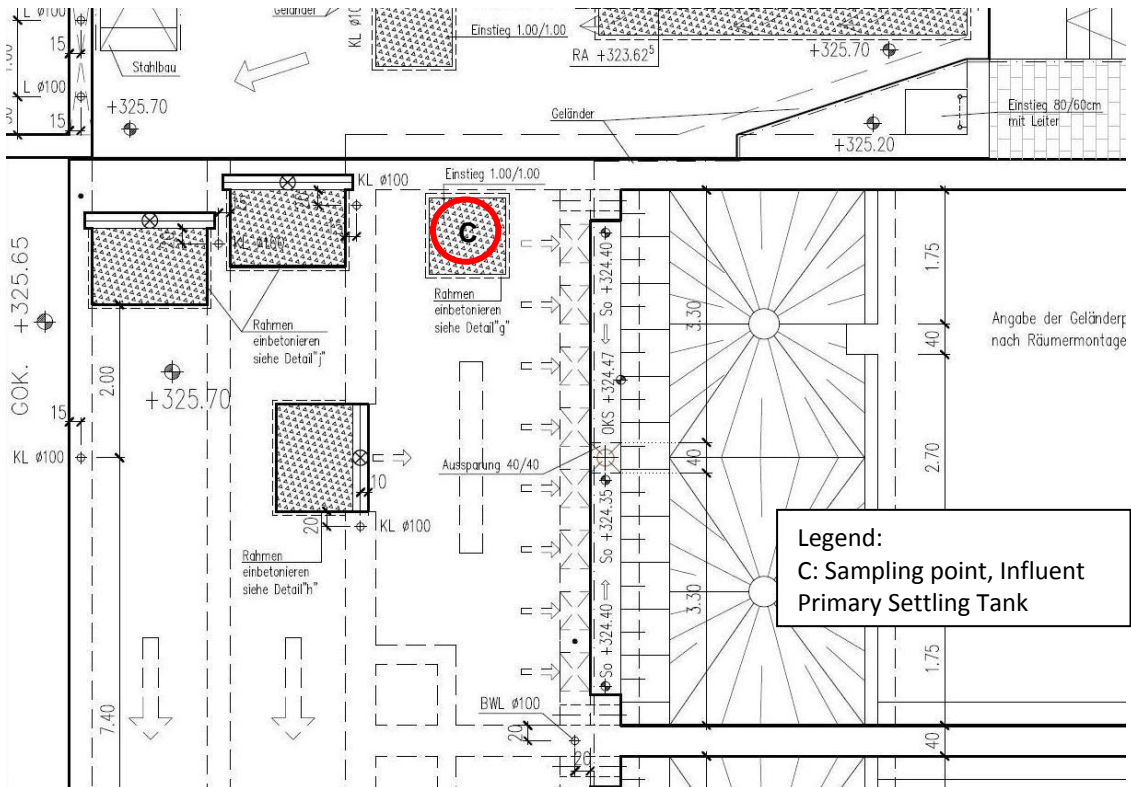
Layout plan of Sampling point at Inlet Primary Sedimentation Tank
